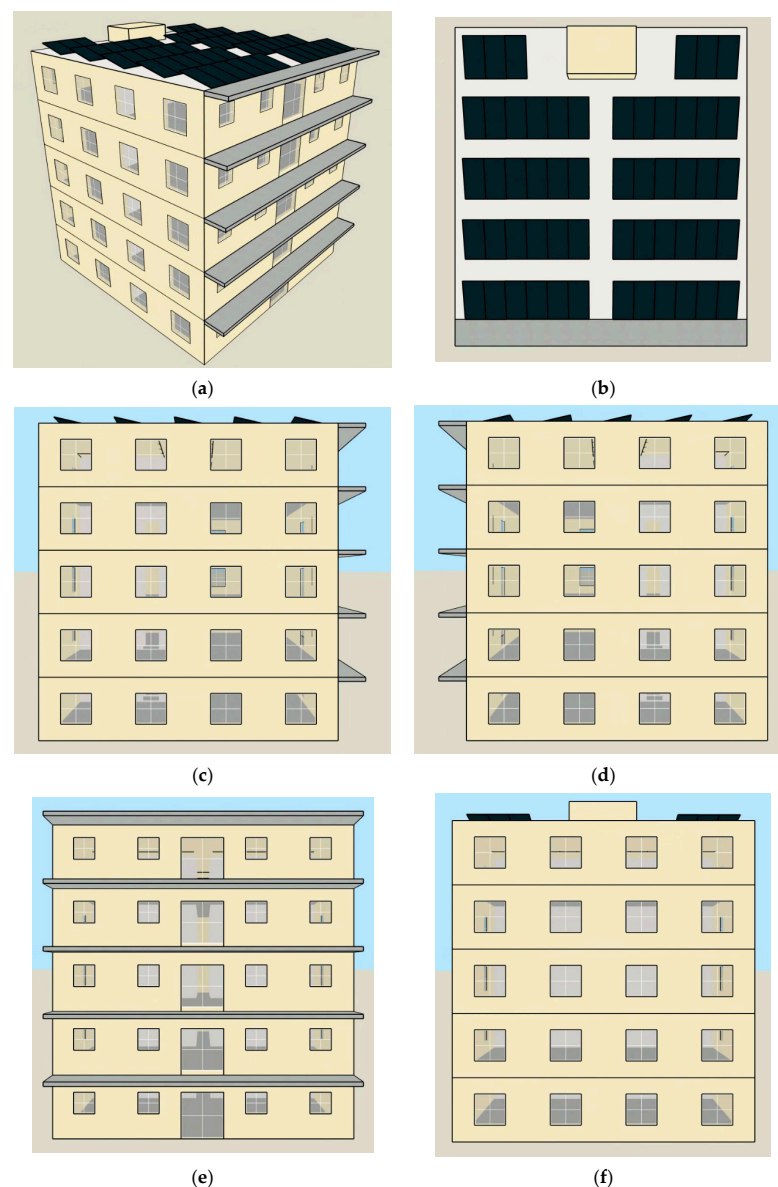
Depiction of examined building B1: (a) south–east axonometric view, (b) plan view, (c) east side, (d) west side, (e) south side and (f) north side.
